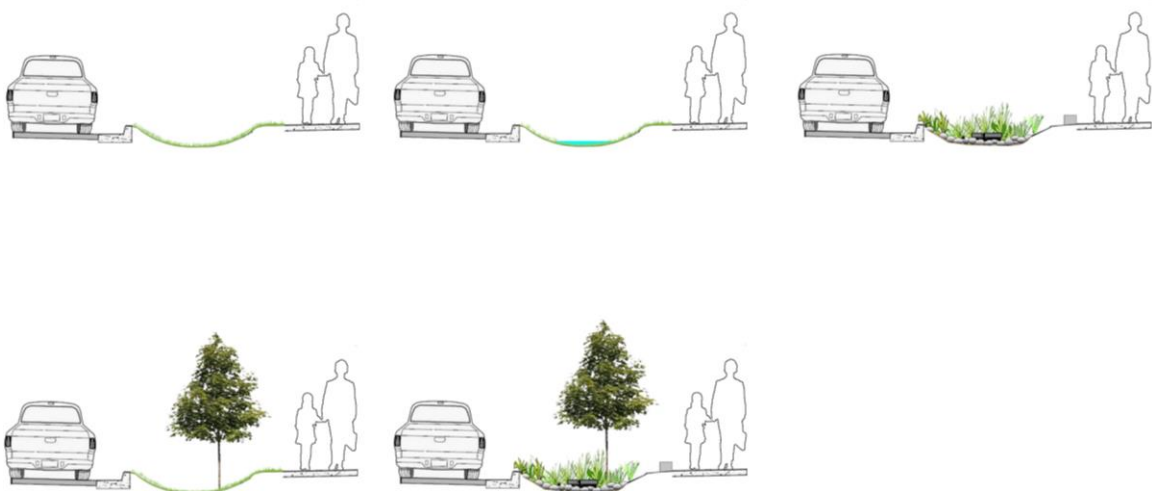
Examples of a bio-swale between the street and sidewalk along with a tree planting with and without understory plantings.
